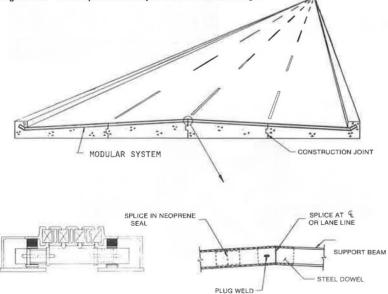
St. John's Bridge in Portland, Oregon, received new expansion joints.
